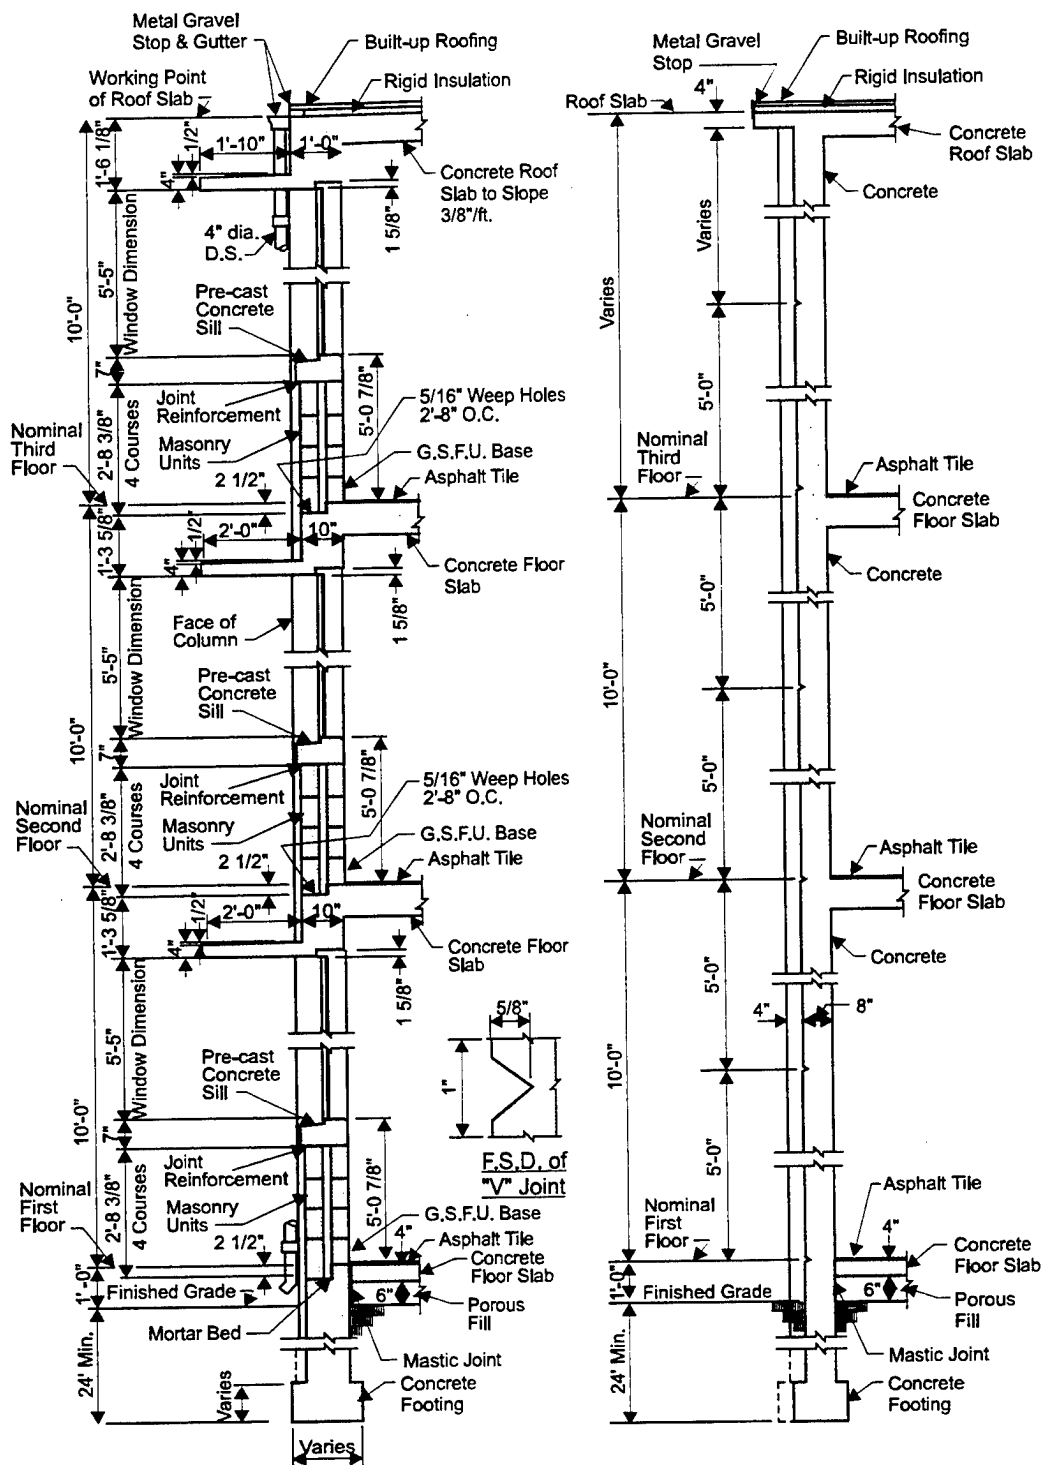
As-Built Drawing of Prototype Building, Exterior Wall Sections
